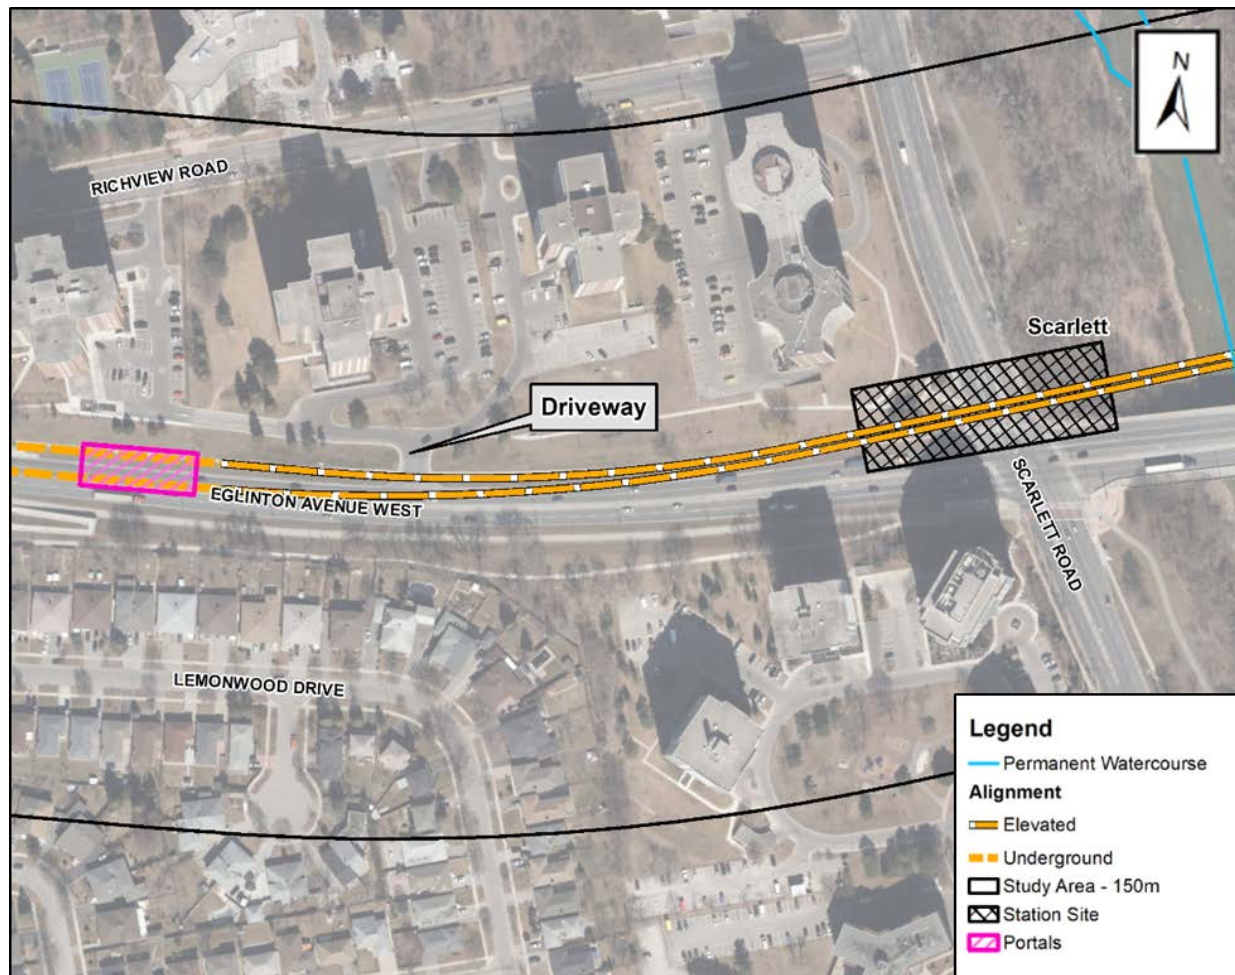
Tunnel Portal west of Scarlett Road & Adjacent Driveway
